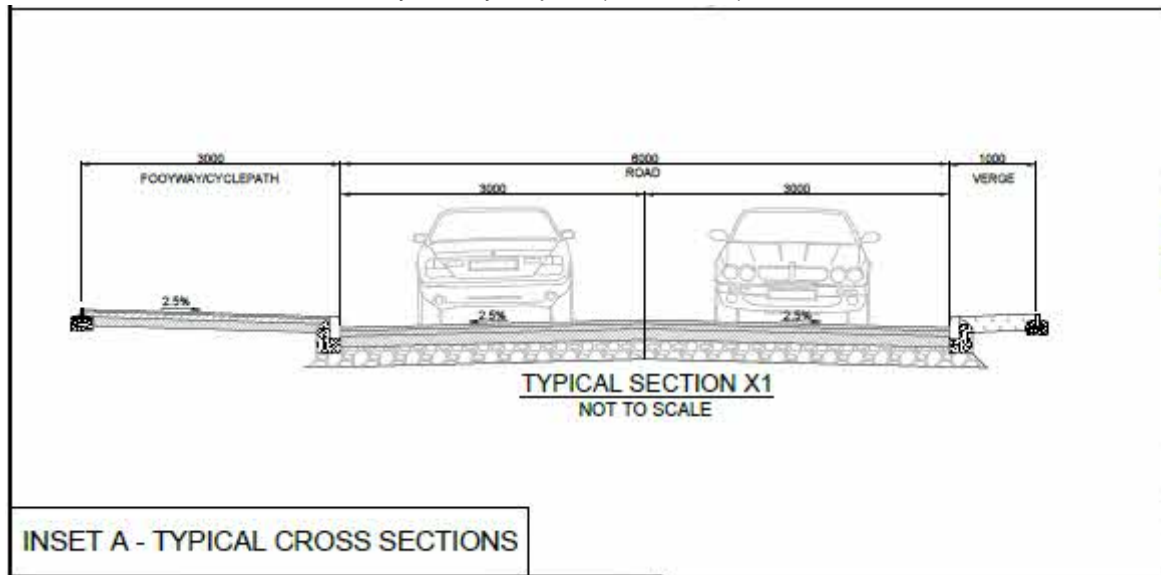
Inset A from enclosed General Arrangement Plan showing a typical section of the spur road
